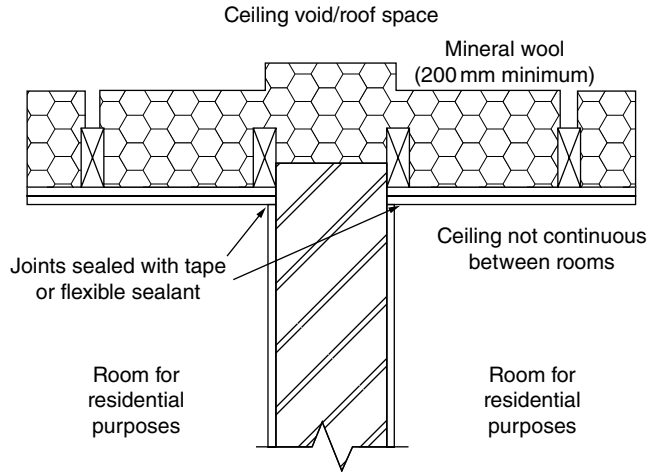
Ceiling void/roof space detail – rooms for residential purposes only.
